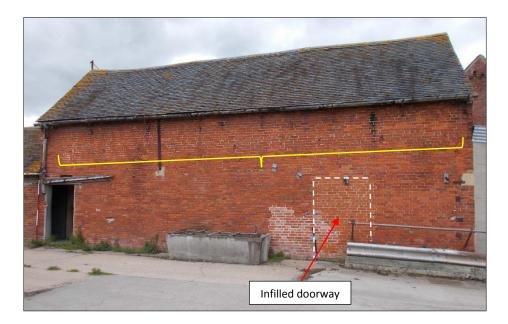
The south-east elevation of the two-storey dairy, looking west. 2m scale rod.
